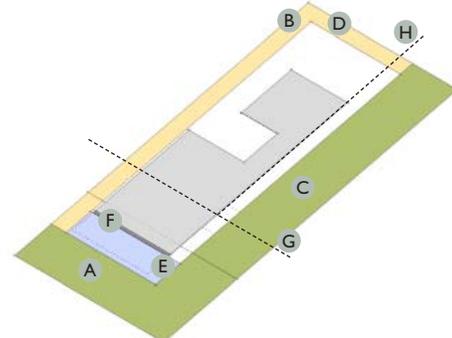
Typical lot setbacks (Yards) and Build-To Zone
